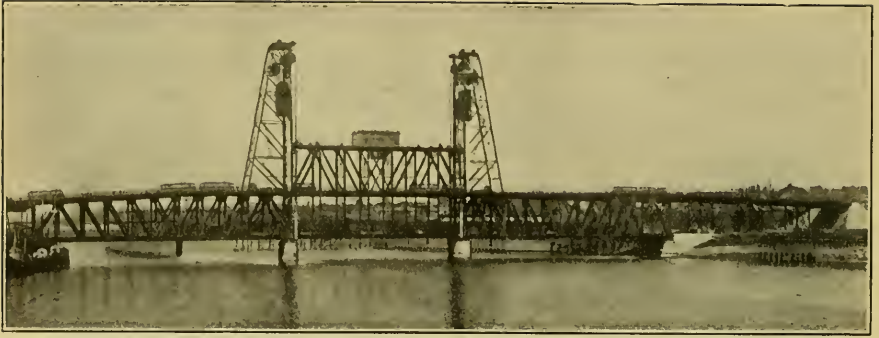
O.-W. R. R. and N. Co.'s Bridge over the Willamette River at Portland, Ore.—Lifting Deck and Lifting Span Down.
